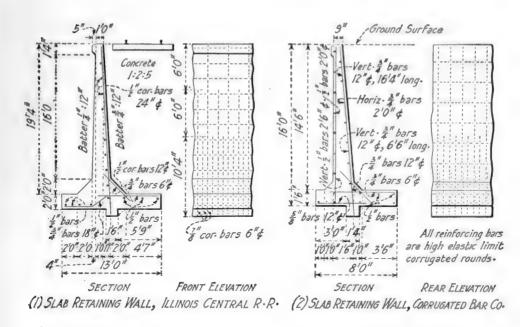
EXAMPLES OF MASONRY RETAINING WALLS.
